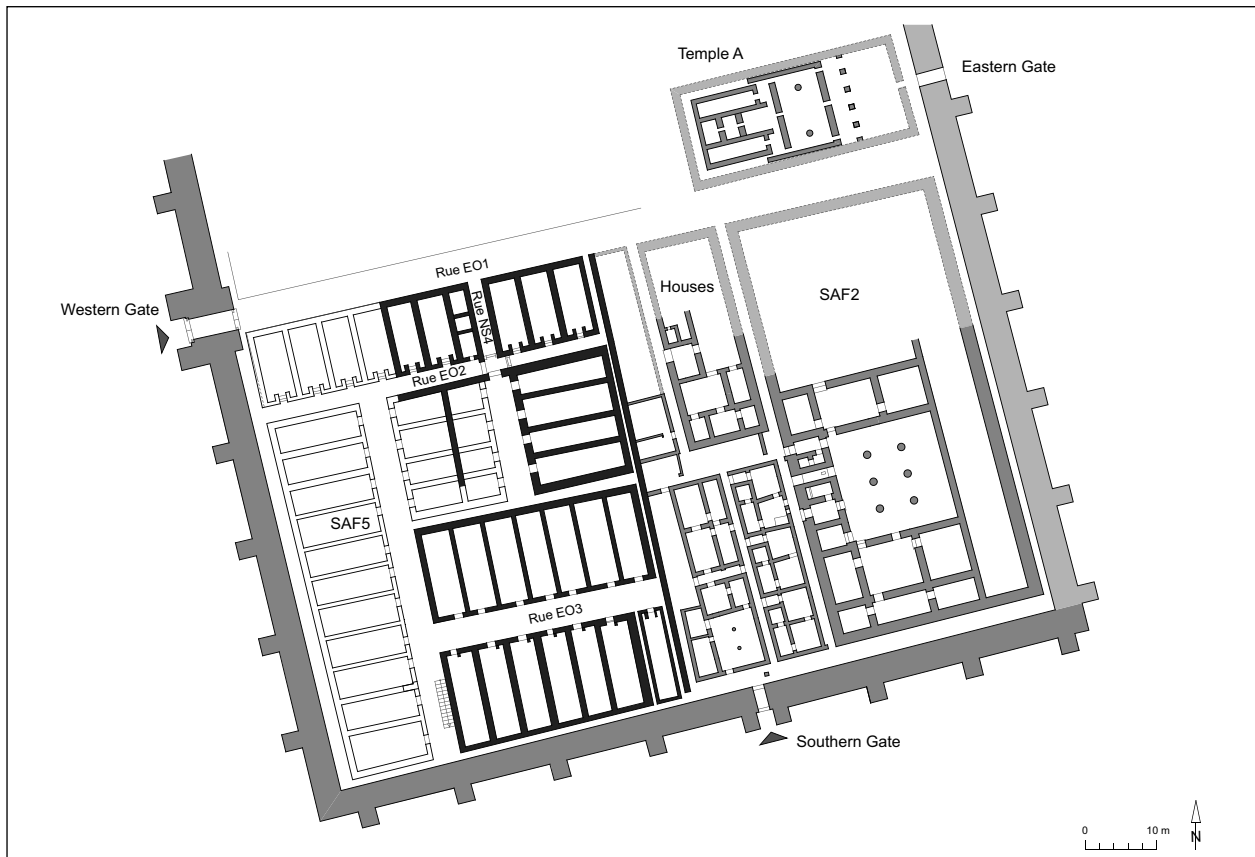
Reconstruction plan of SAF5 with presumed magazines on the western side
